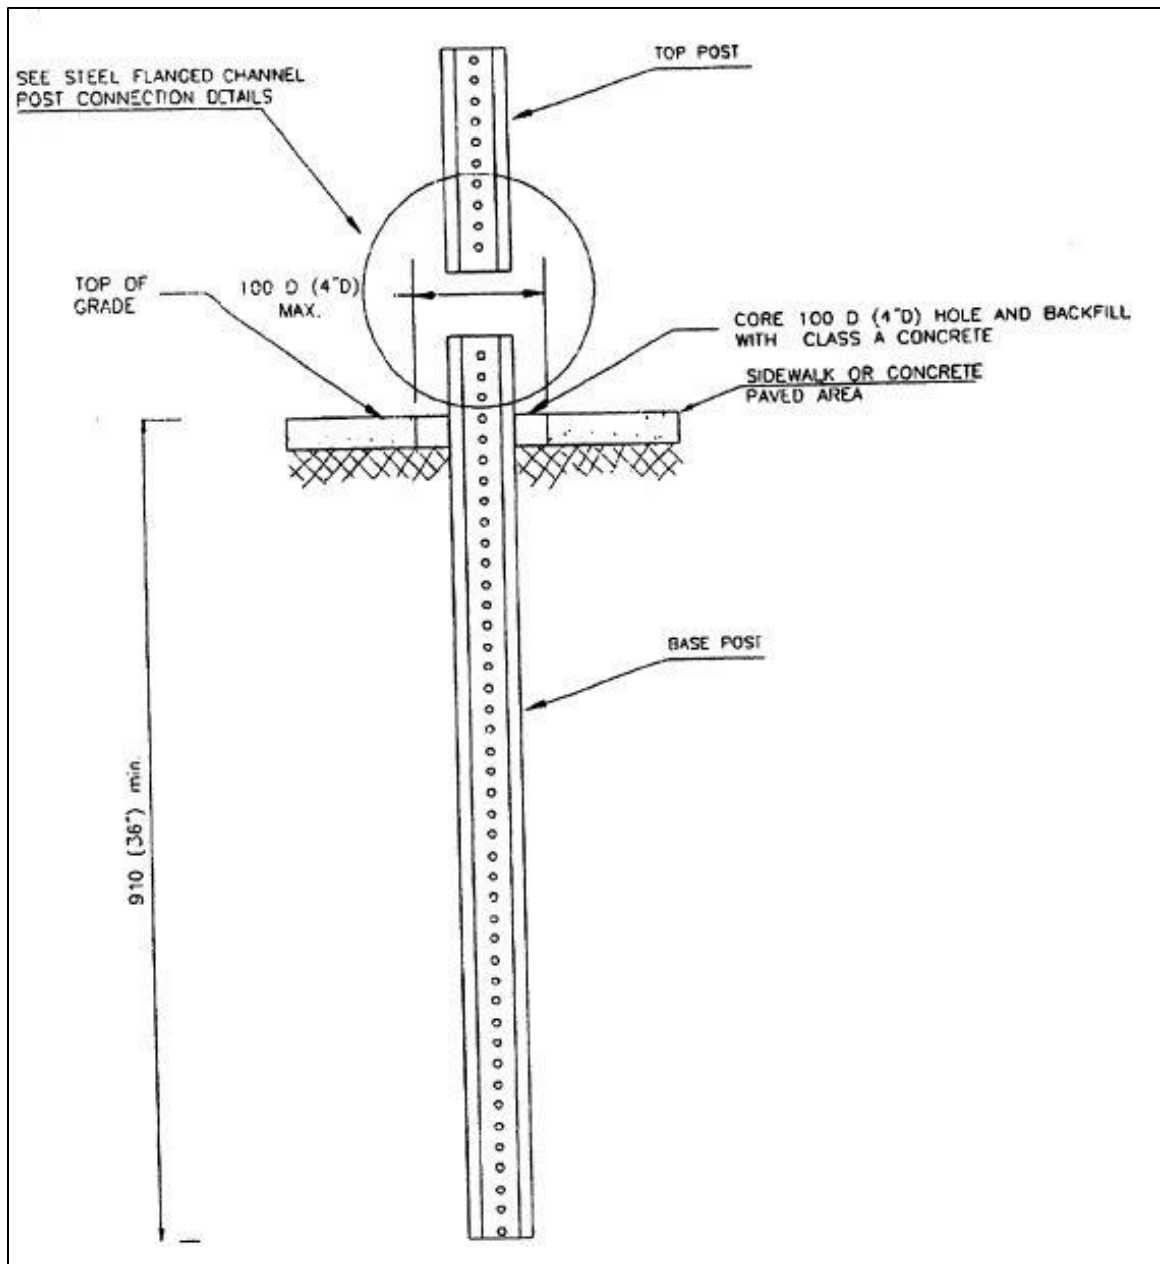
U-channel foundation detail for location with concrete slab (PRHTA, 2010)
